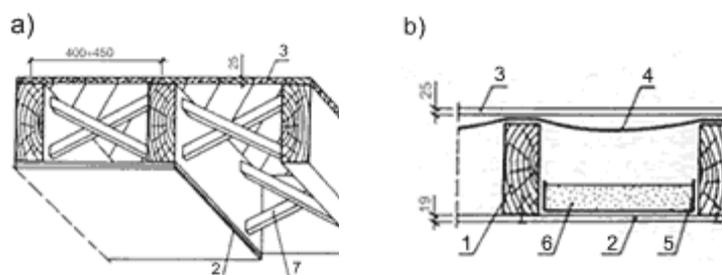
Wooden ceiling beam: a) the floor and the headliner, b) bare, insulated from the attic, 1-beam, 2-wool, 3-board, 4-plaster, 5-improv, 6-papa or film.
